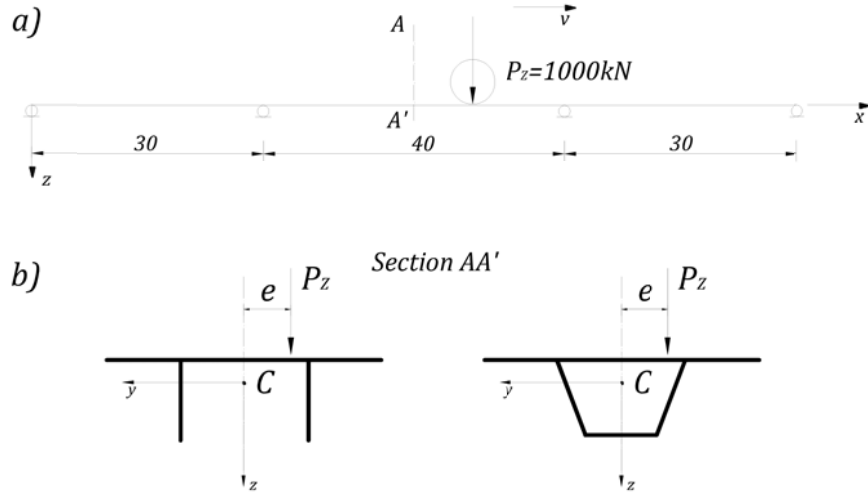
Longitudinal beam-like model (a) and layout of the cross-section analyzed (b)
